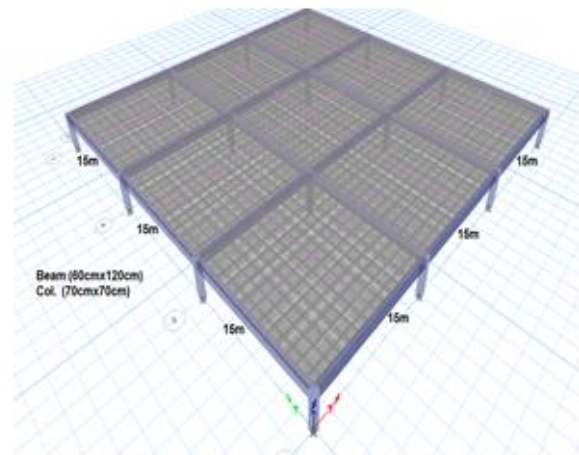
3D-View show Building with one story for Slab Size (15mx15m)
